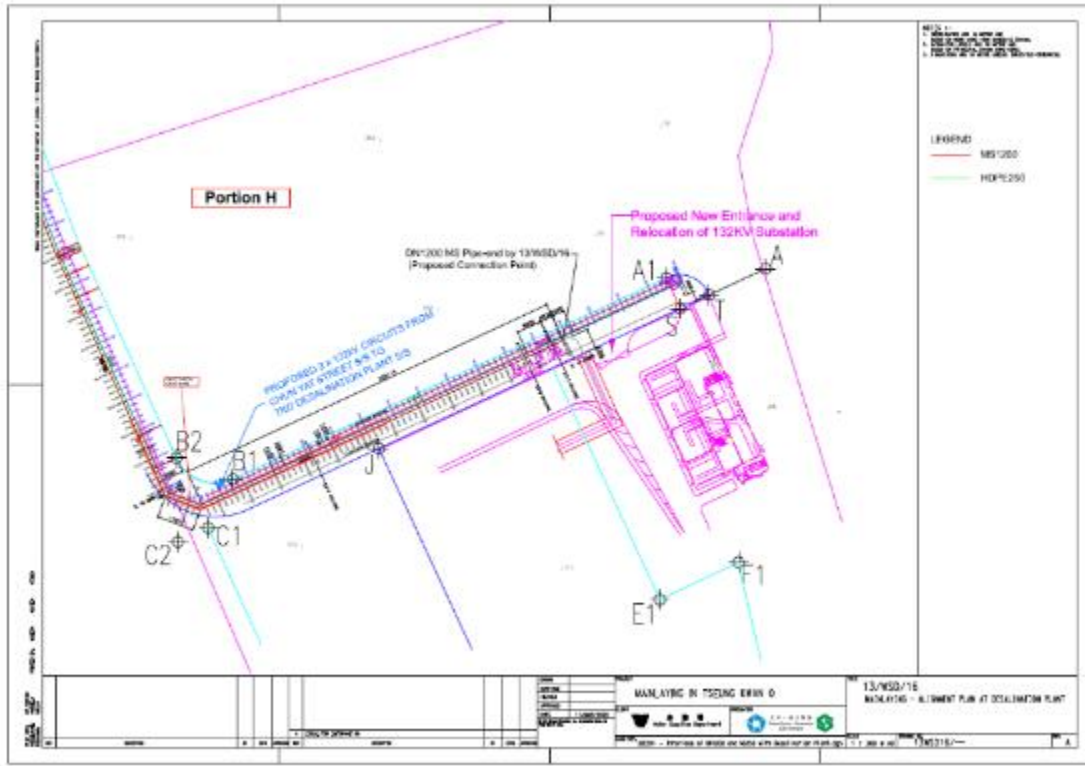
Location Plan for CH.CT 0+07 – 2+58
